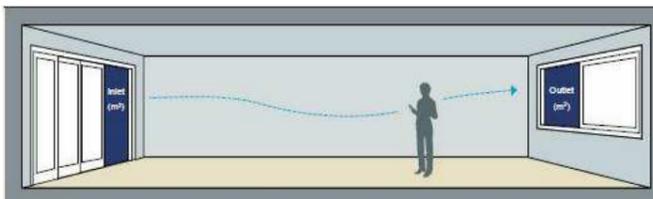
B.3 Effective cross ventilation is achieved when the inlet and outlet have approximately the same area, allowing air to be drawn through the apartment using opposite air pressures on each side of the building
